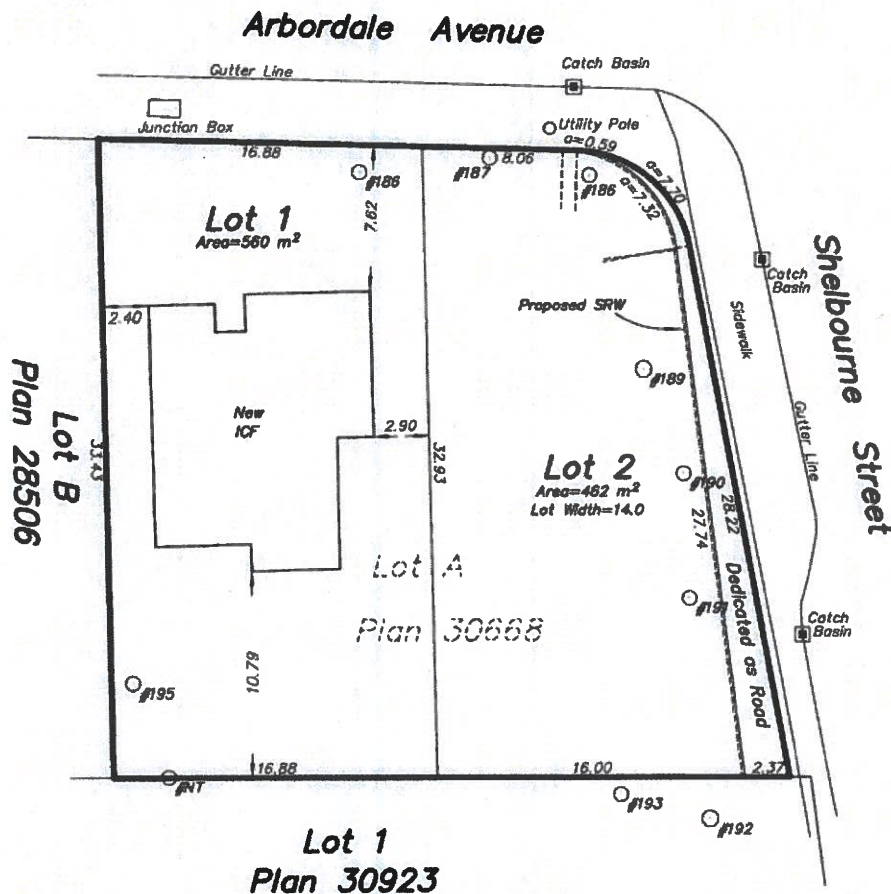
Proposed Subdivision (from plan by Wey Mayenburg Land Surveying Inc.)
